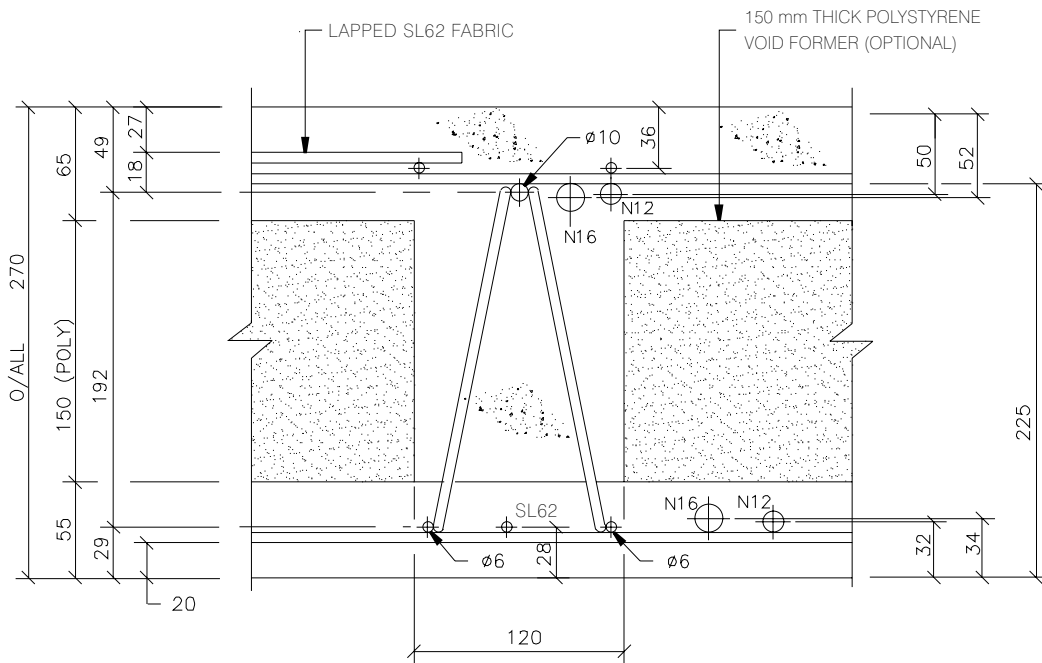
Typical, but not restricted to, reinforcement arrangements in slabs
